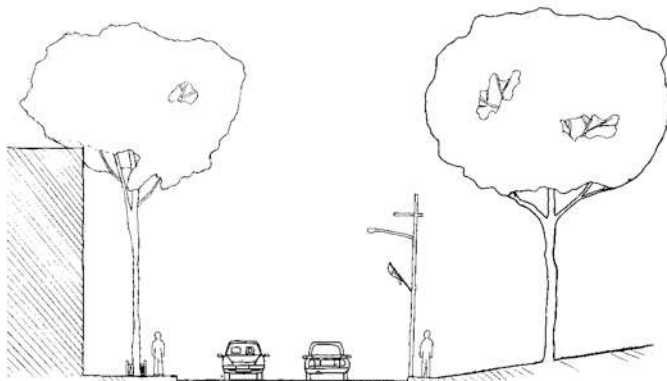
Existing streetscape conditions on 117 near the Town Hall.
